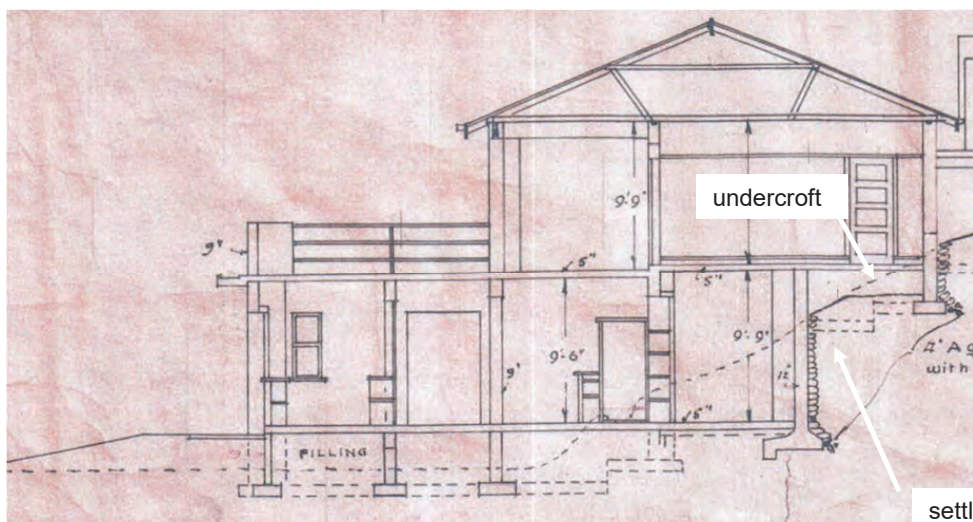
Section from original blueprints showing the sub floor footings and walls and fill between.
